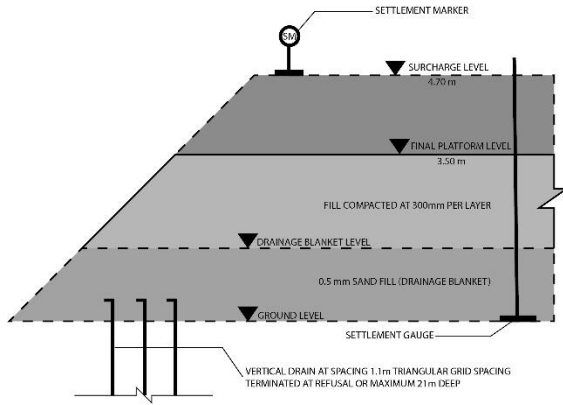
Cross-section of ground treatment with PVD and surcharge
